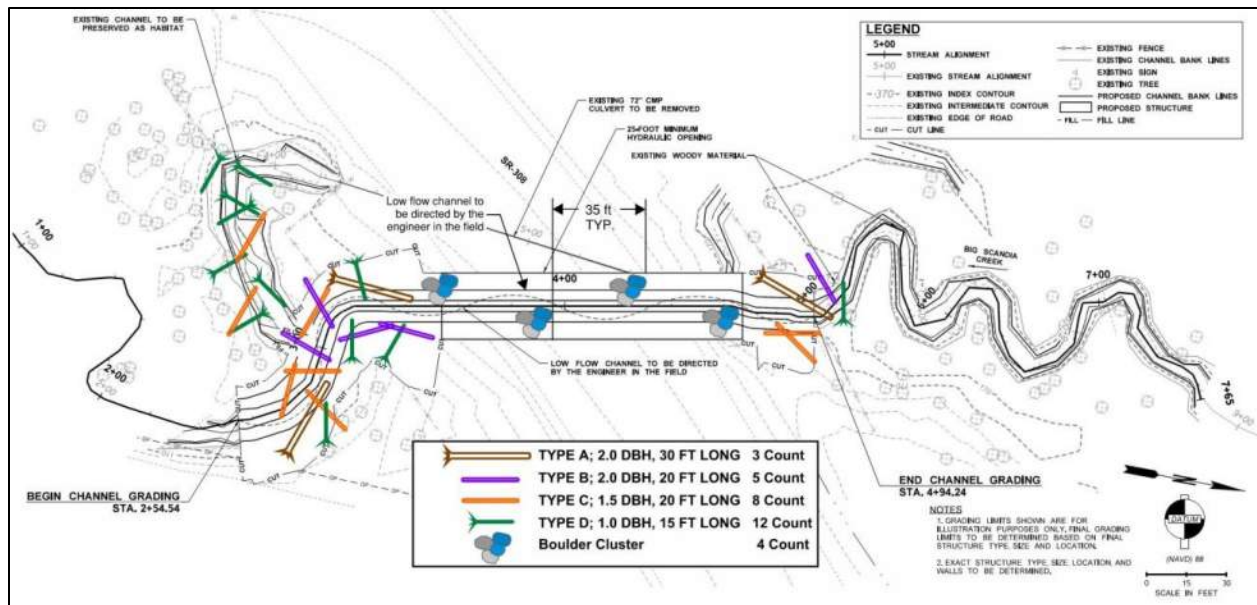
Conceptual layout of habitat complexity (Assumption structure type - Culvert)
